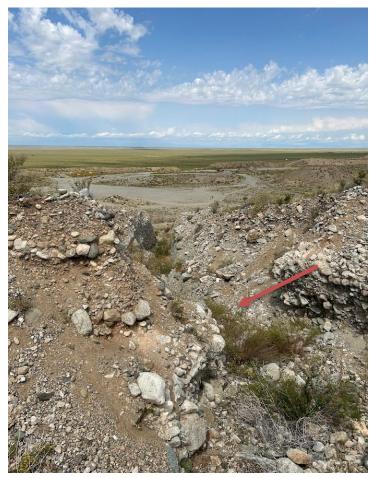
South Pit Area Highwall with erosion gully, facing west.
